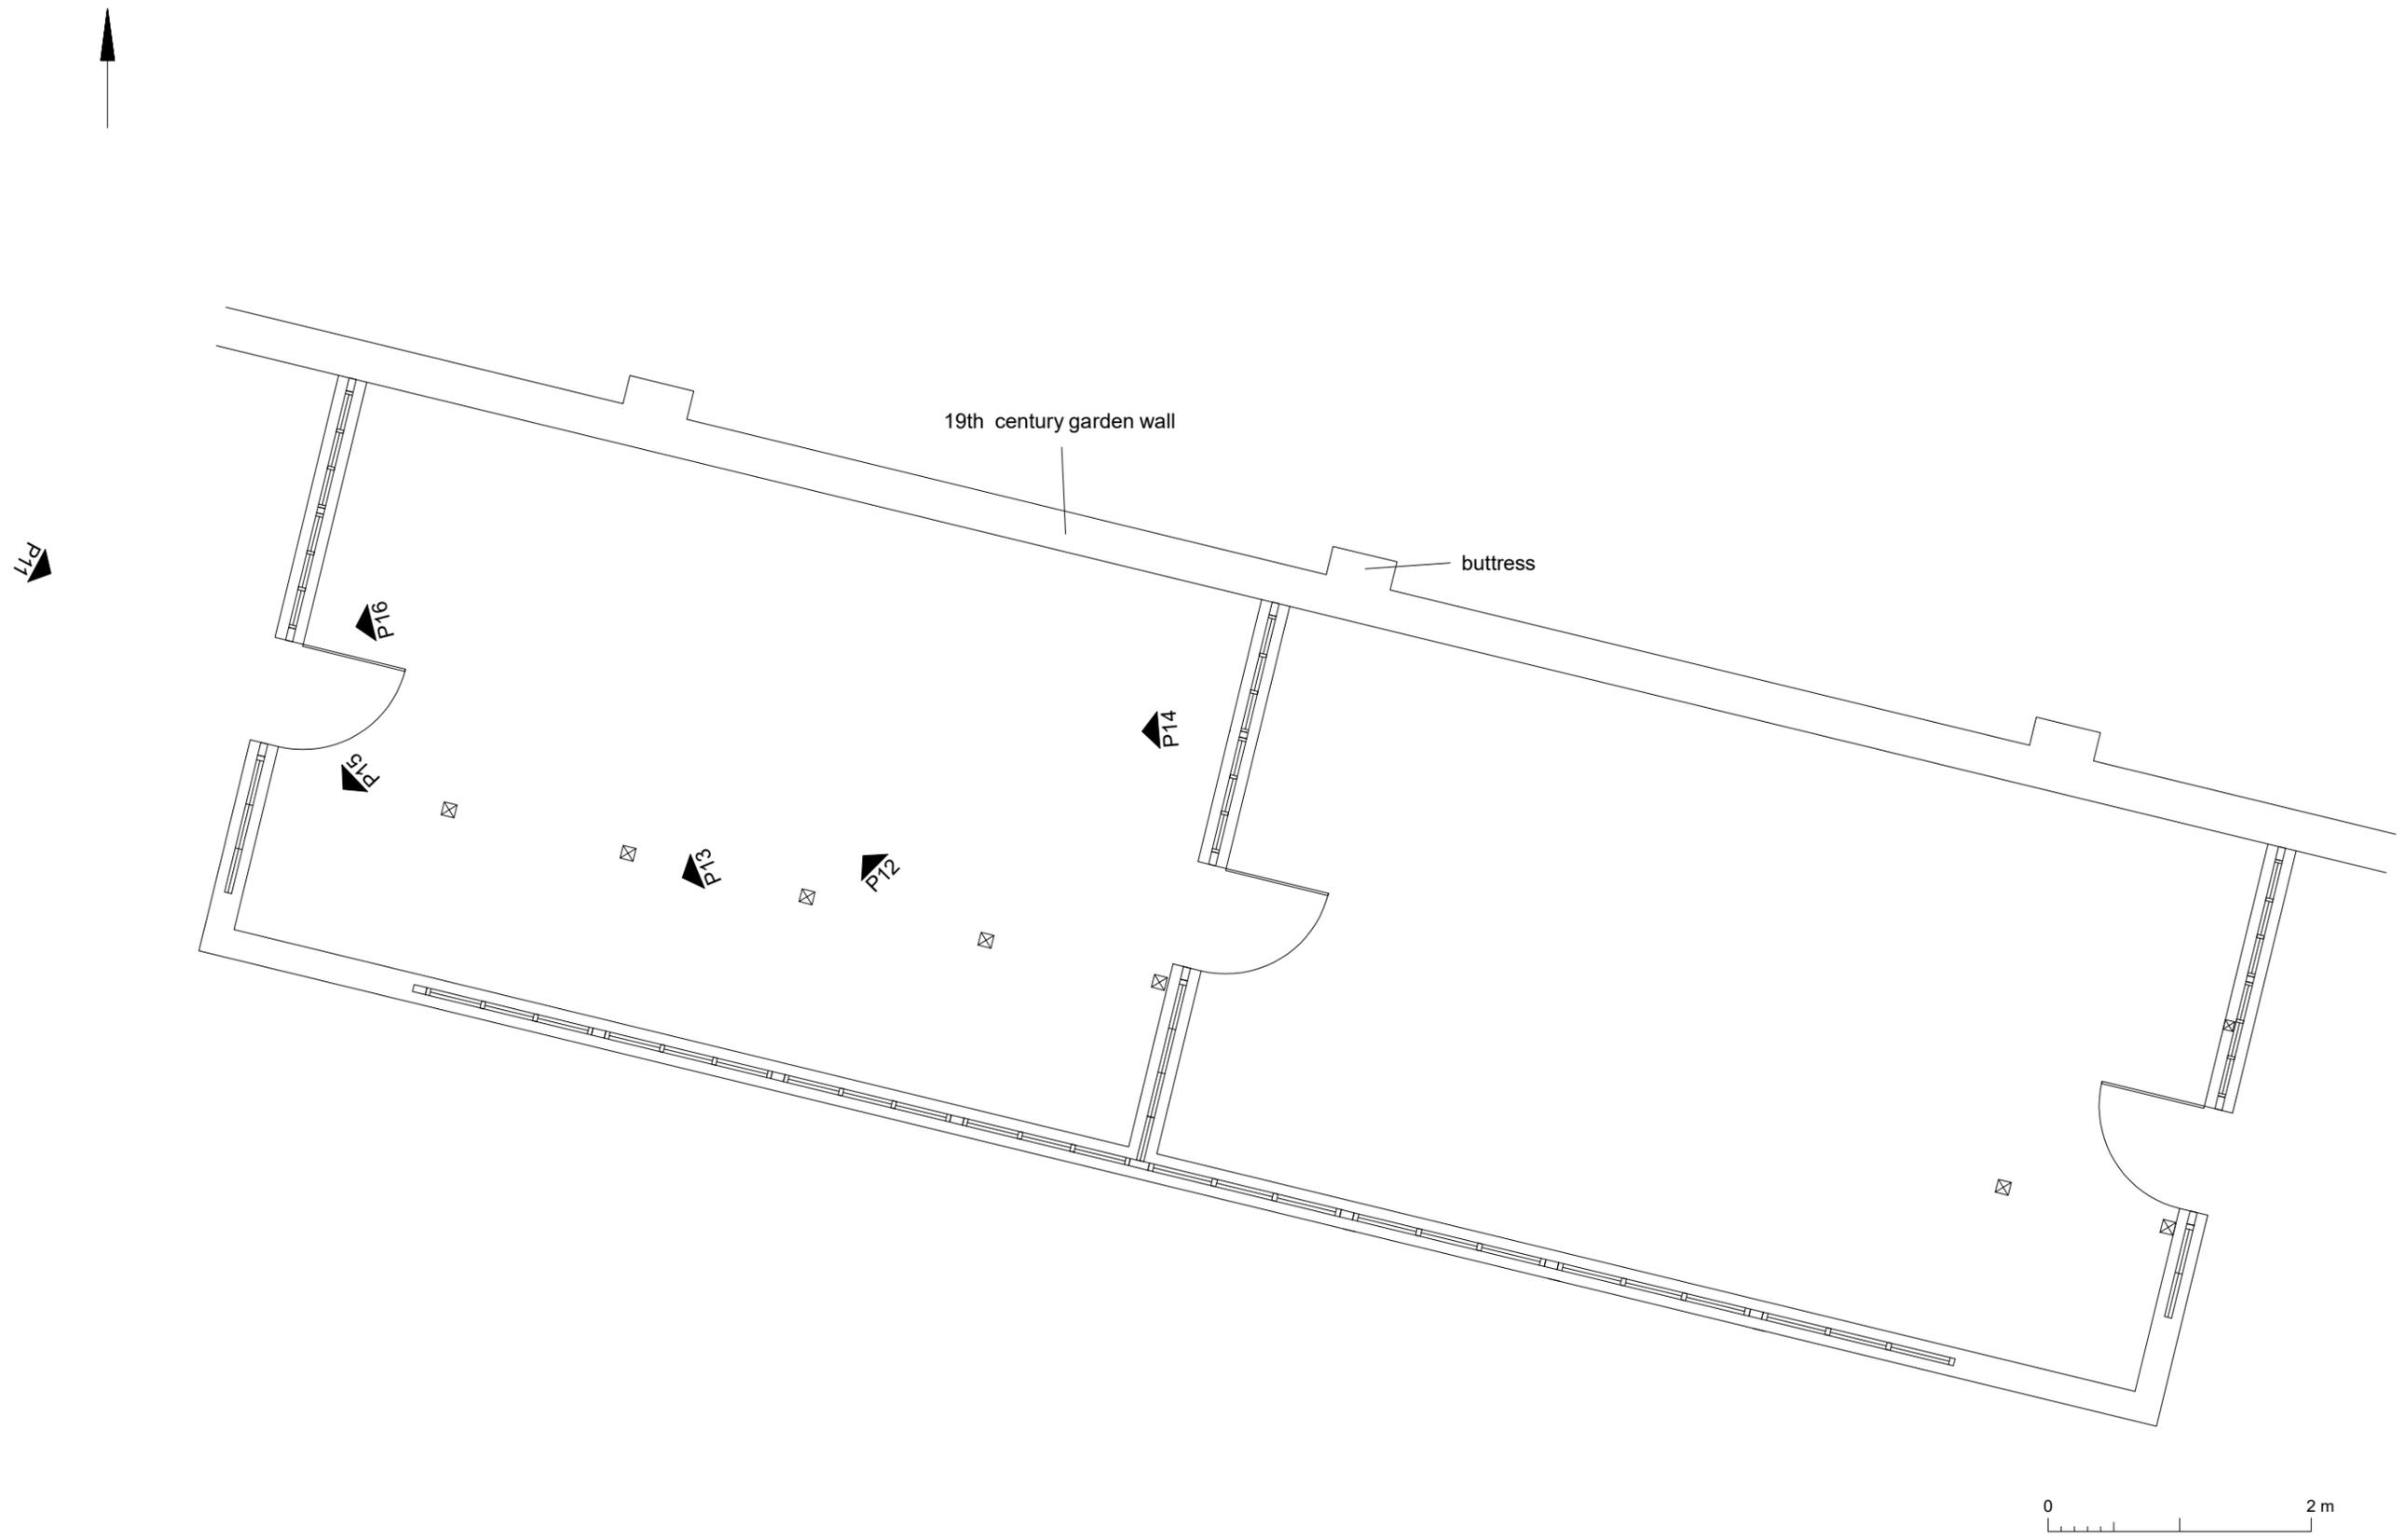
Glasshouse floor plan. Location and direction of photographs reproduced in the text shown.
